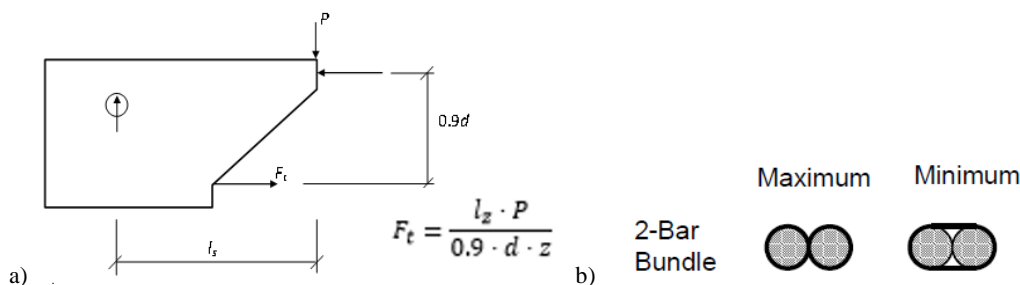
(a) Structural scheme to obtain the applied load from the tensile load reinforcement, and (b) Equivalent perimeter for bundled reinforcement bars proposed by [10]
